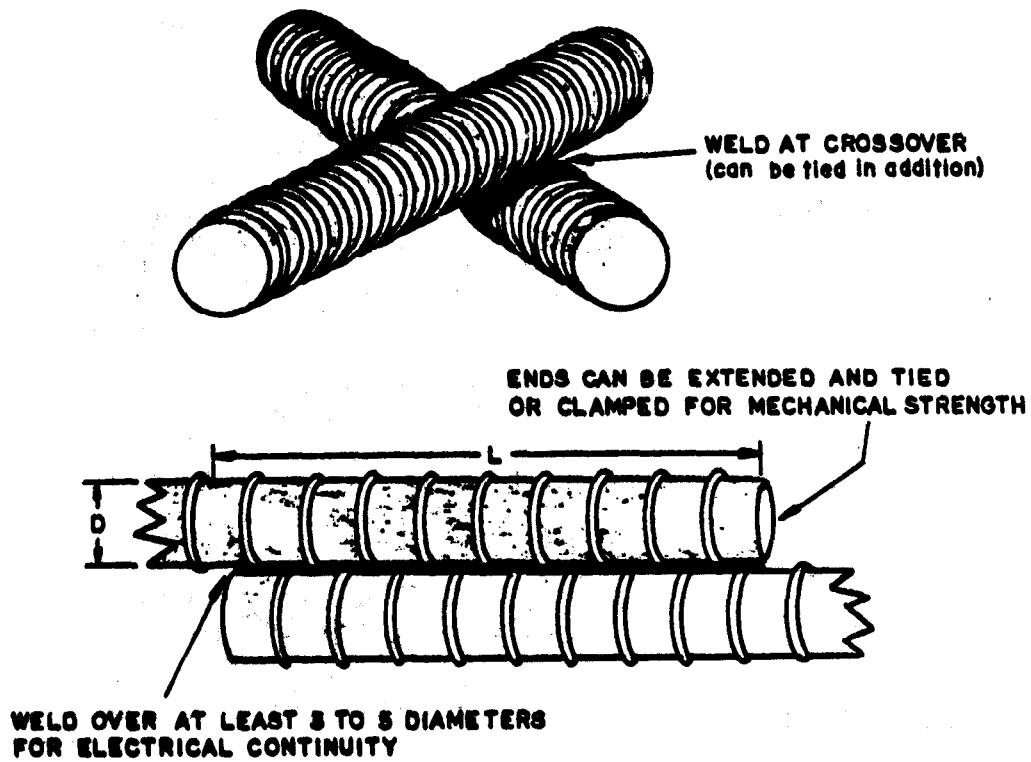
Reinforcement steel welding practice. (Source: ref 5-7)
